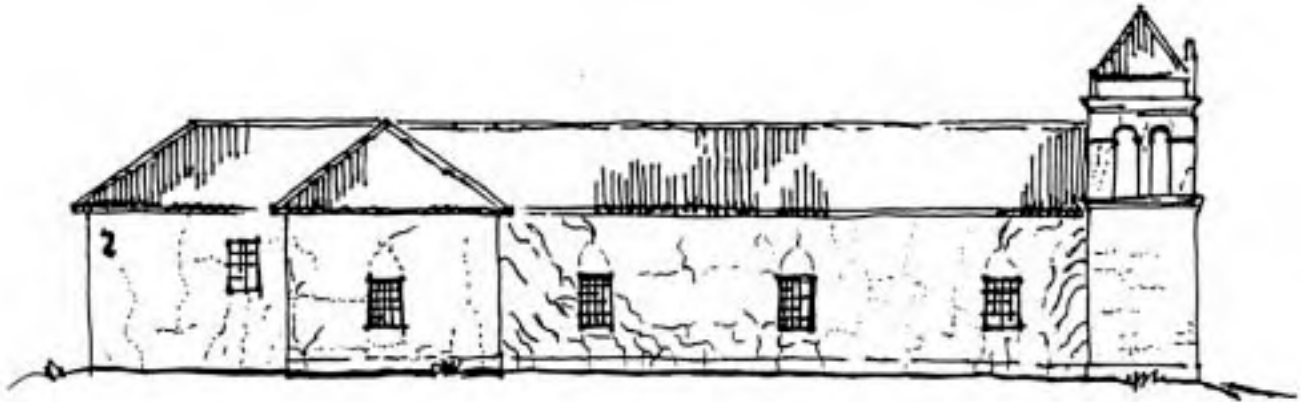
East wall elevations showing existing crack patterns. The pattern at either end of the east wall are consistent with structural movement.
